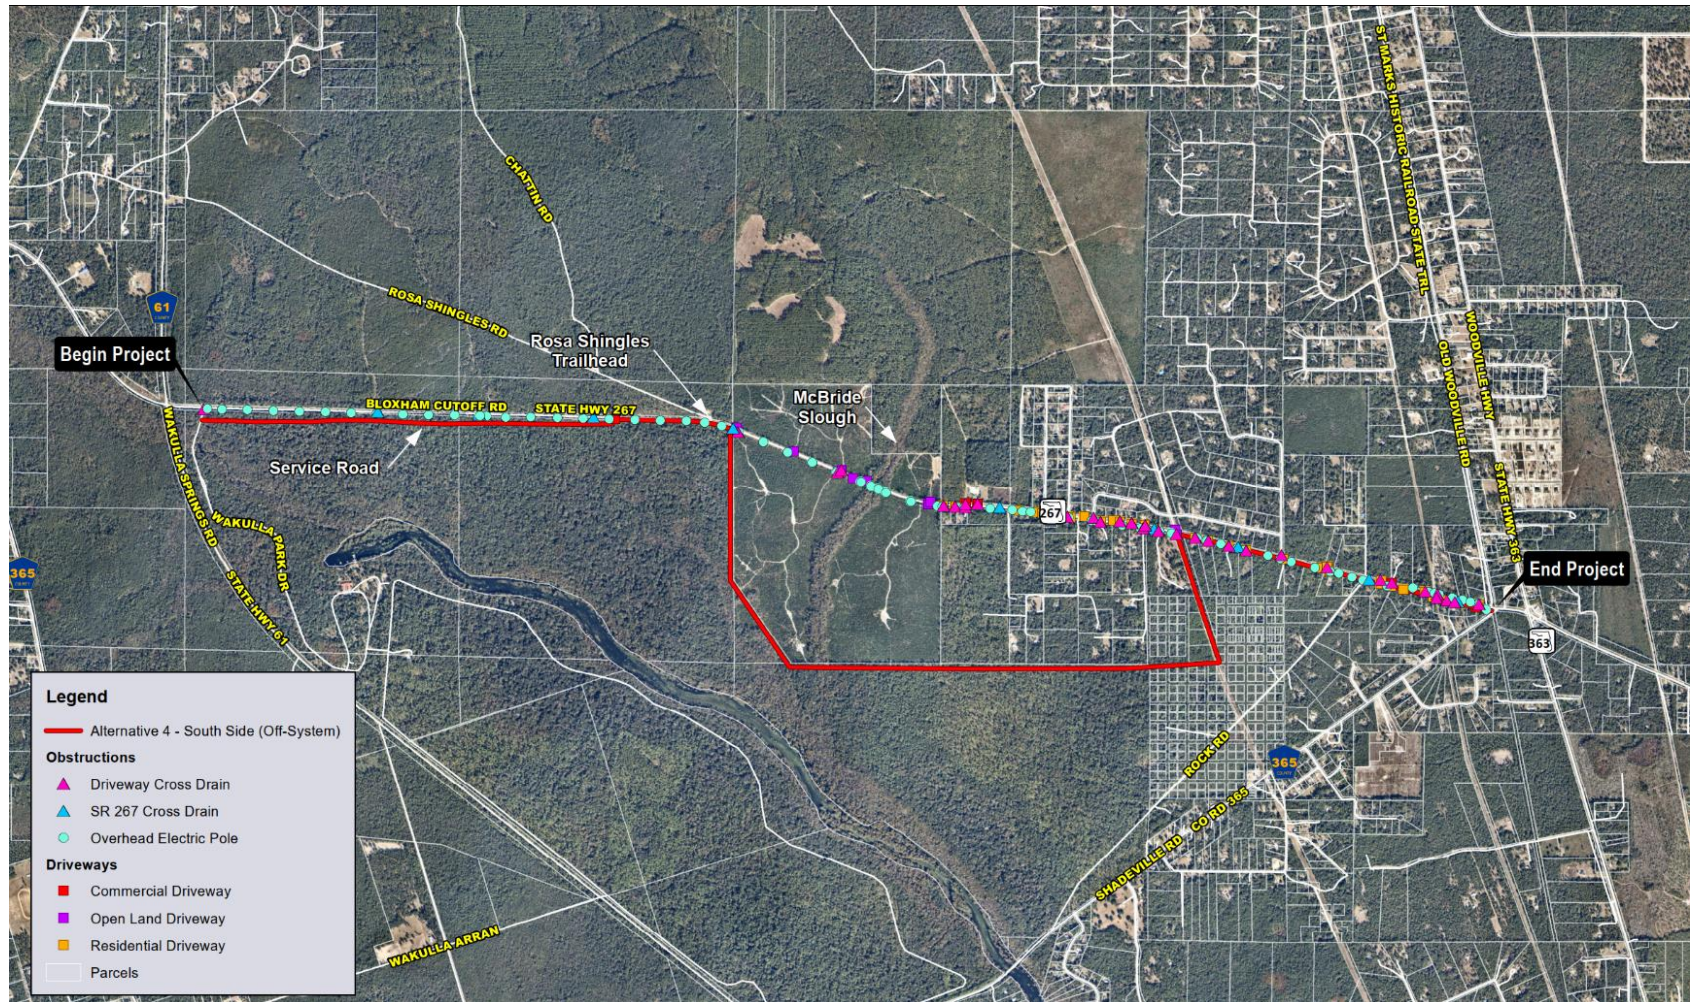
Alternative 4: Park Service Road/South Side of SR 267 (Off System)
